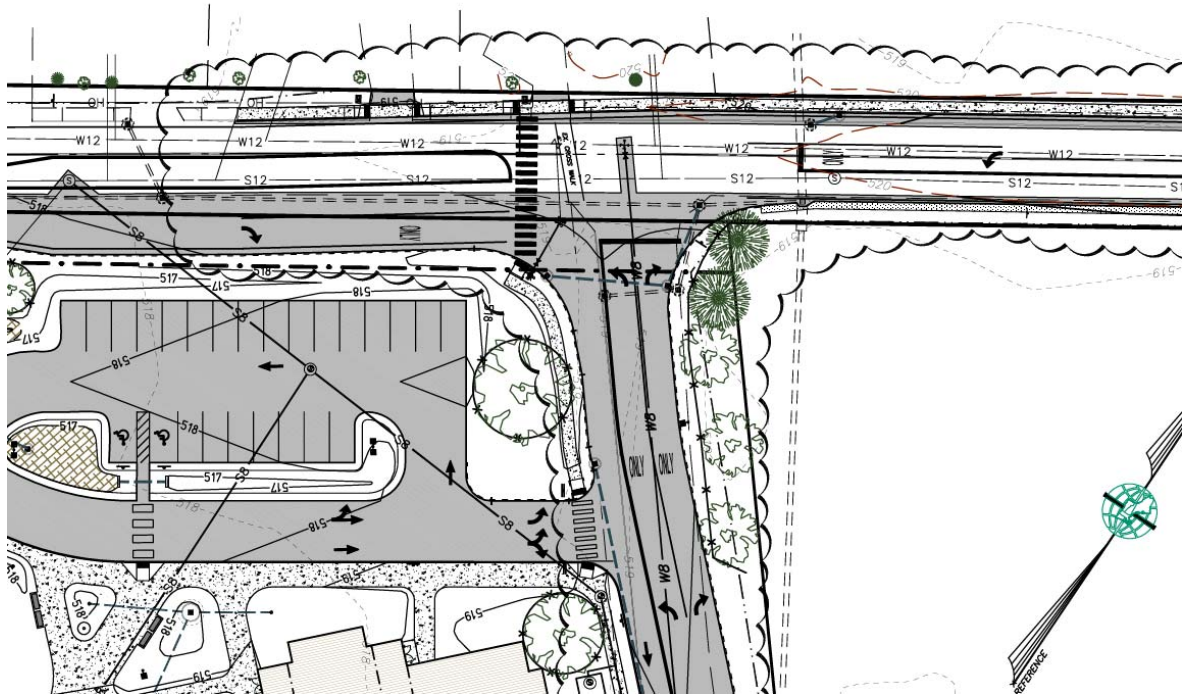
Construction Plans for Maple Ave-JDES Intersection (source: Meridian Land Services, Inc.)
